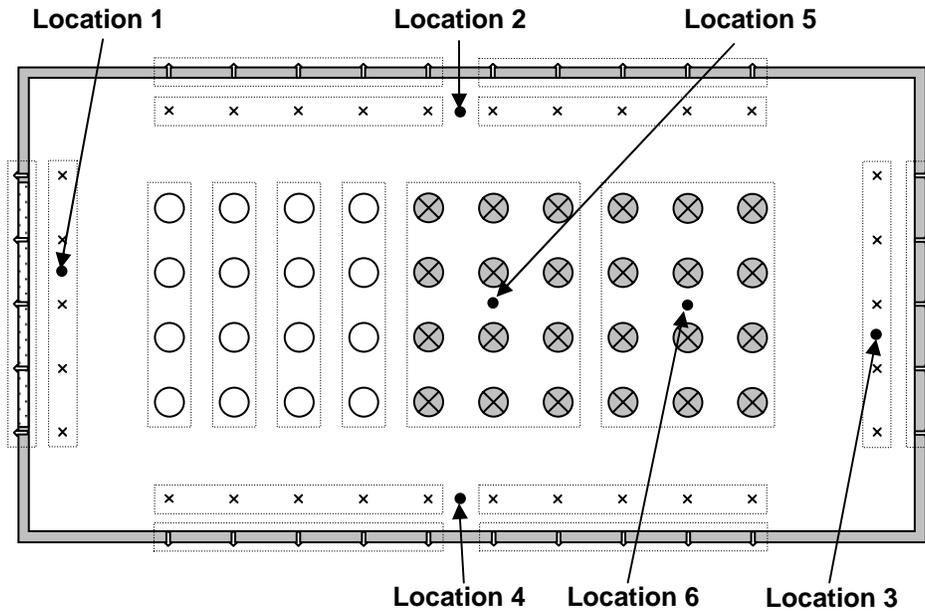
Plan view of iButton locations for the mock bridge deck
